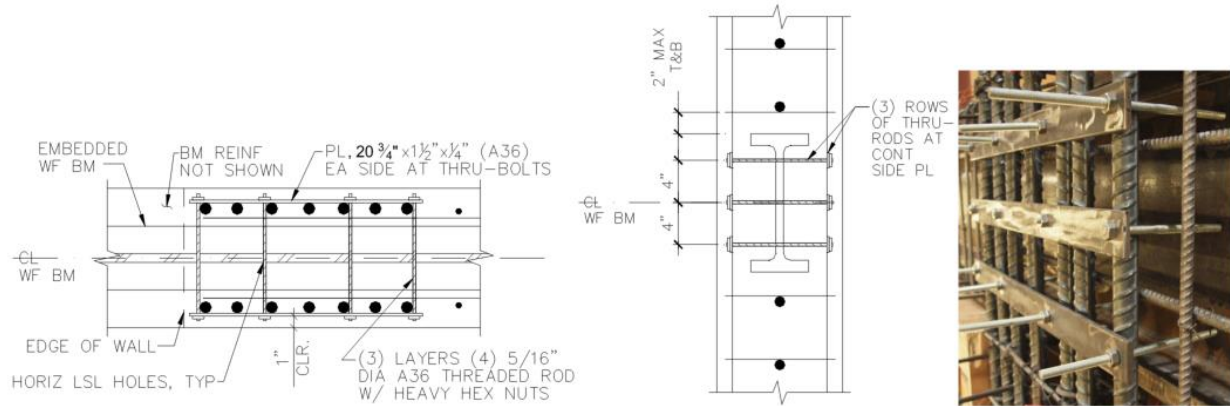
Tests of concrete-encased steel wide-flange sections
